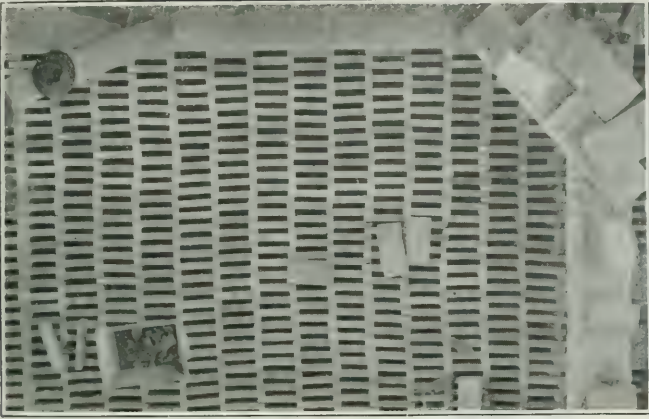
Typical masonry, Gay-Lussac tower.
